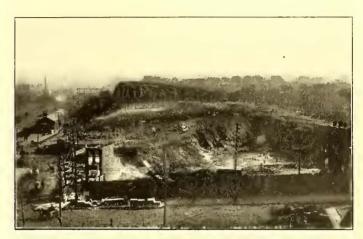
POWER-HOUSE SITE ON OCT. 11, 1902
